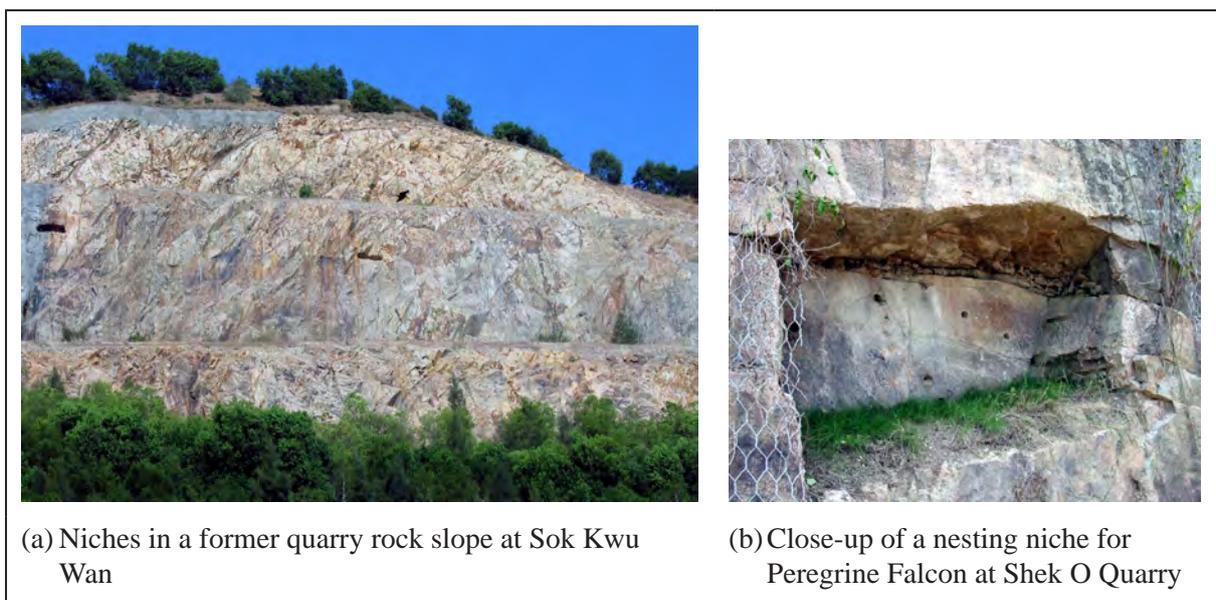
Provision of Nesting Niches on Rock Slopes in Rural Area
